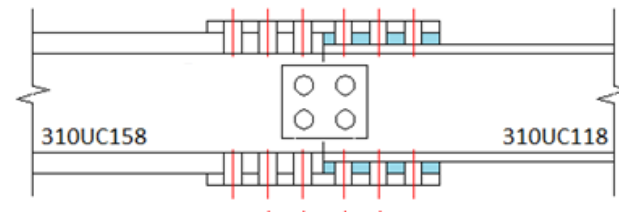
Schematic view of Specimen #3, (20mm flange plates and 6mm filler plates)
